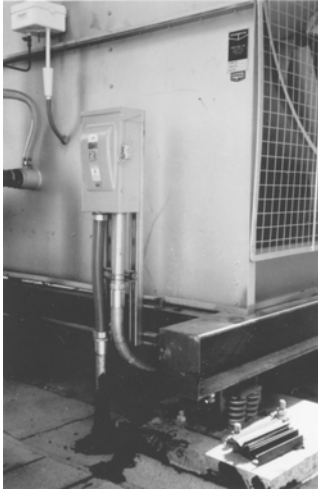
Taut outdoor “flexible” conduit forms a vibration “short-circuit” at cooling tower. The grillage under the cooling tower is resting on spring isolators, but the short conduit between the disconnect and the roof penetration transmits tower vibration into the roof.
